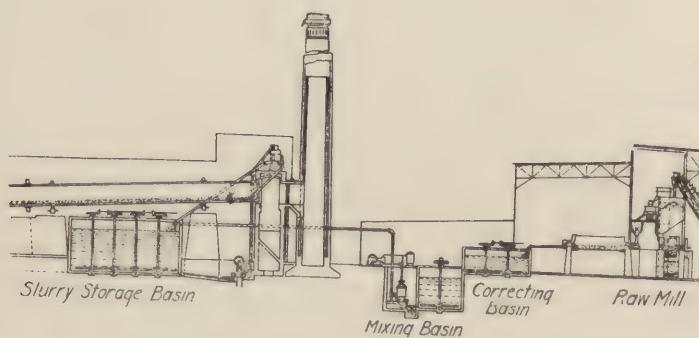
Raw mill—Pyramid Portland Cement Co., Des Moines, Ia.
